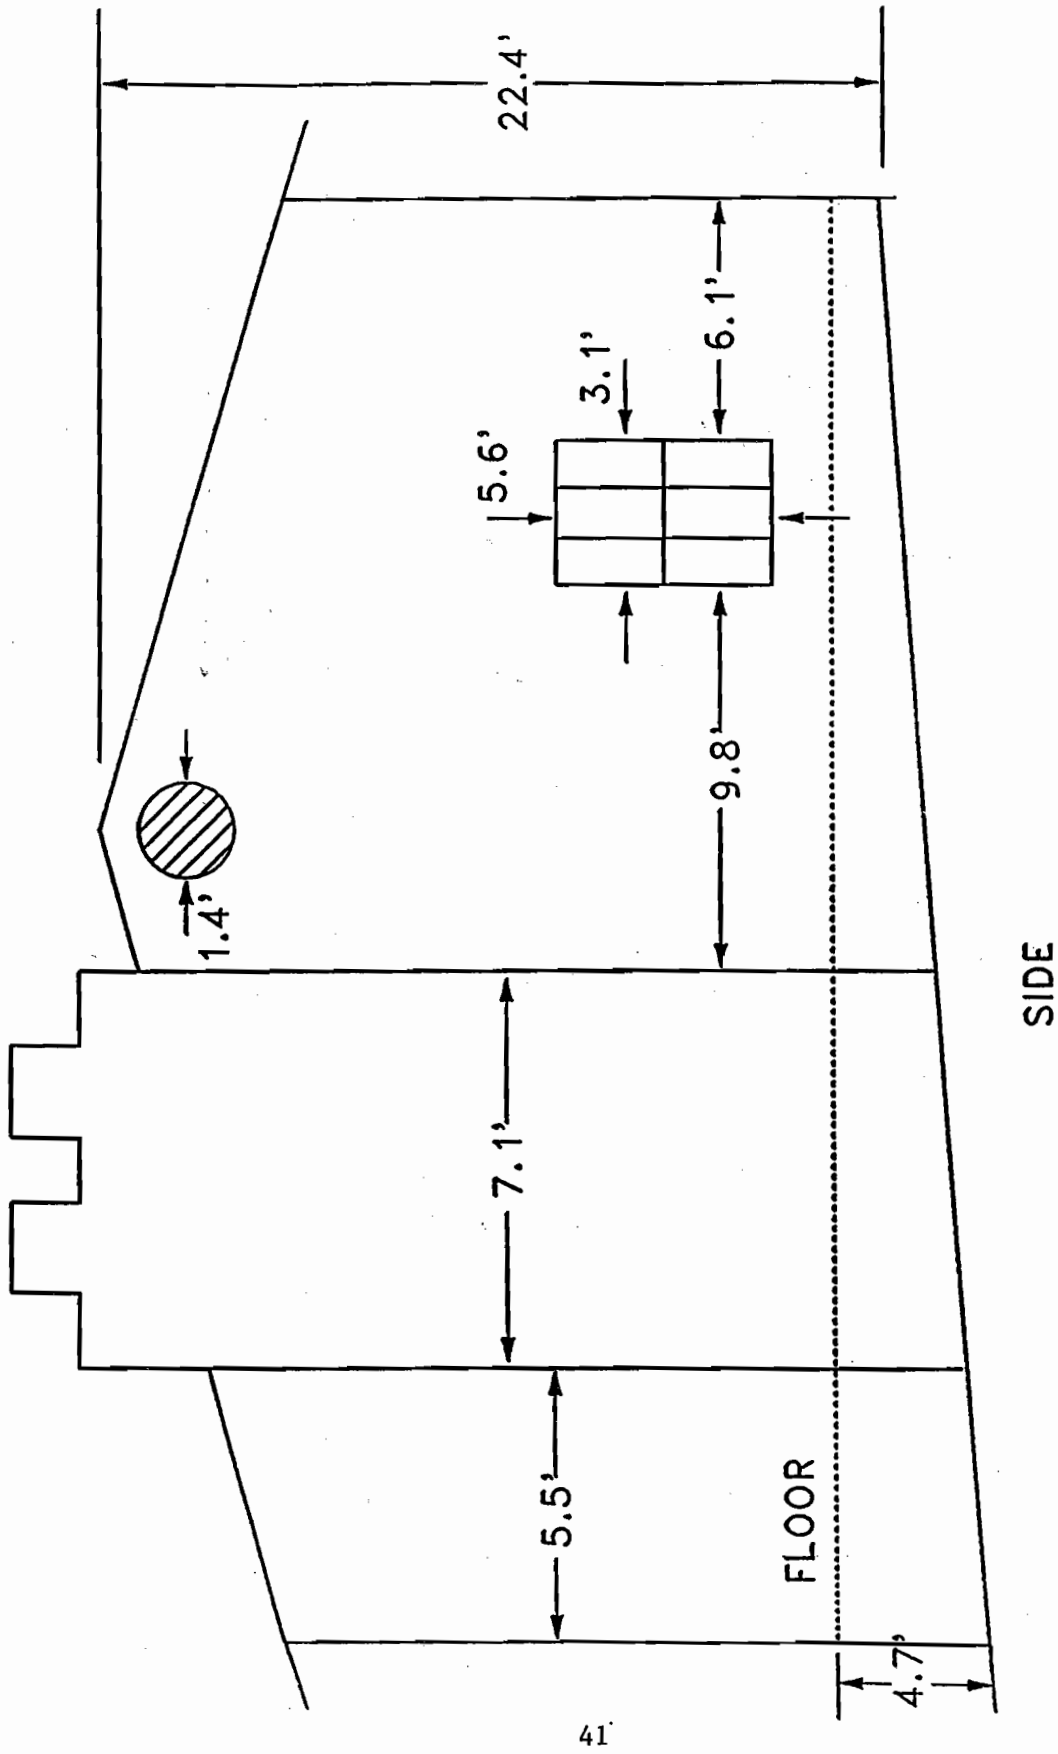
Schematic and dimensions of elevation of chimney side of the two-story house
